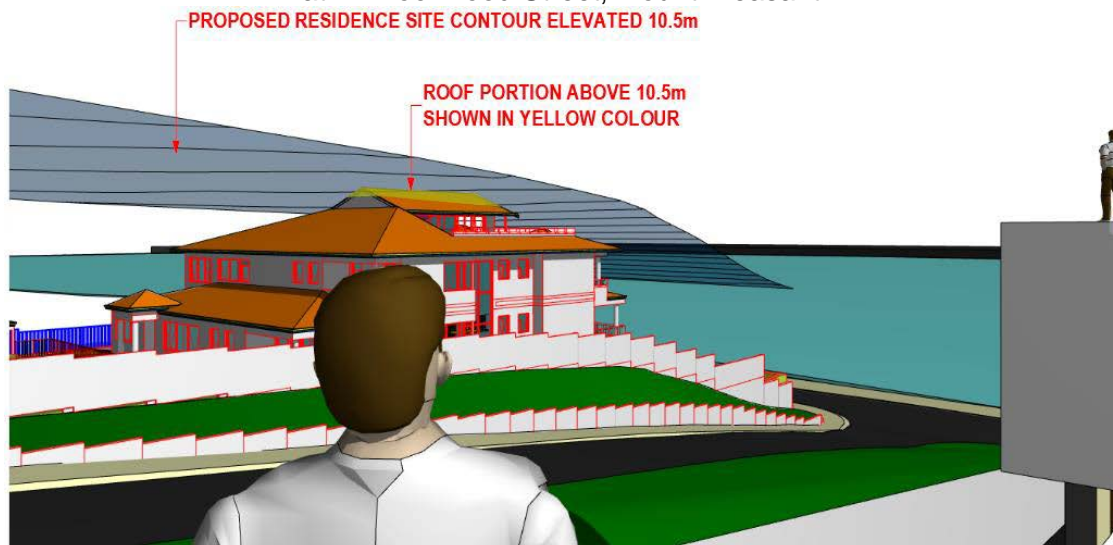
Applicant's perspective view of the proposed dwelling as viewed from the verandah at 1/20 Rookwood Street, Mount Pleasant.
